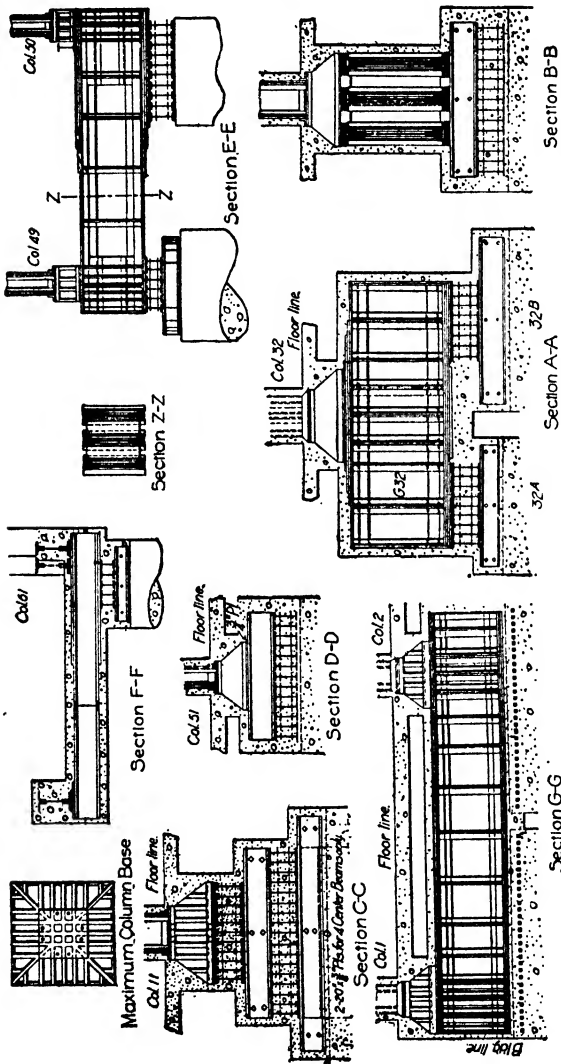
Column Footings of Plate Girders and Grillages, Woolworth Building, New York City. For column 11 the diameter of the pier is 18 ft. 9 in. and the column load is 9,423,000 lb. For this column the grillage is made for four tiers of 24-in. I-beams with flange reinforcement plates for the top tier and web reinforcement plates for the bottom tier. Section E-E shows the common method of supporting wall columns when the foundation must be kept back of the property line.
